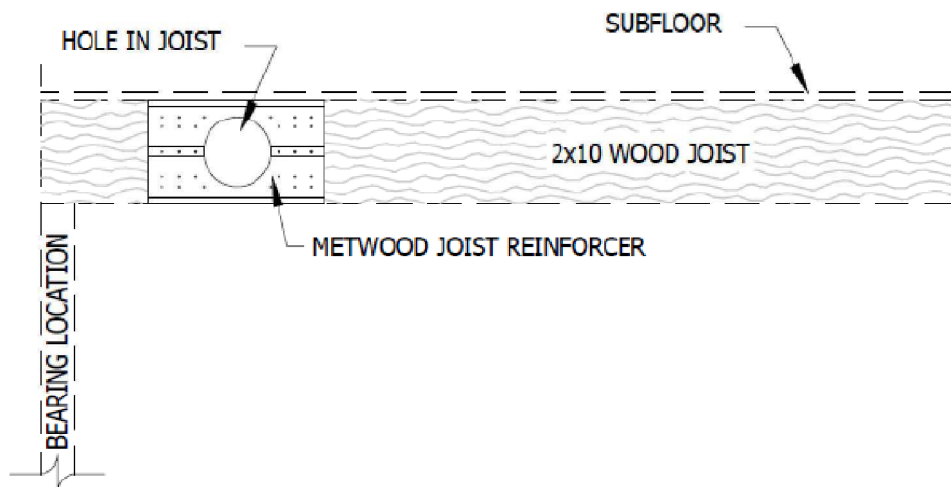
INSTALLATION DIAGRAM OF 2810HR JOIST REINFORCER
